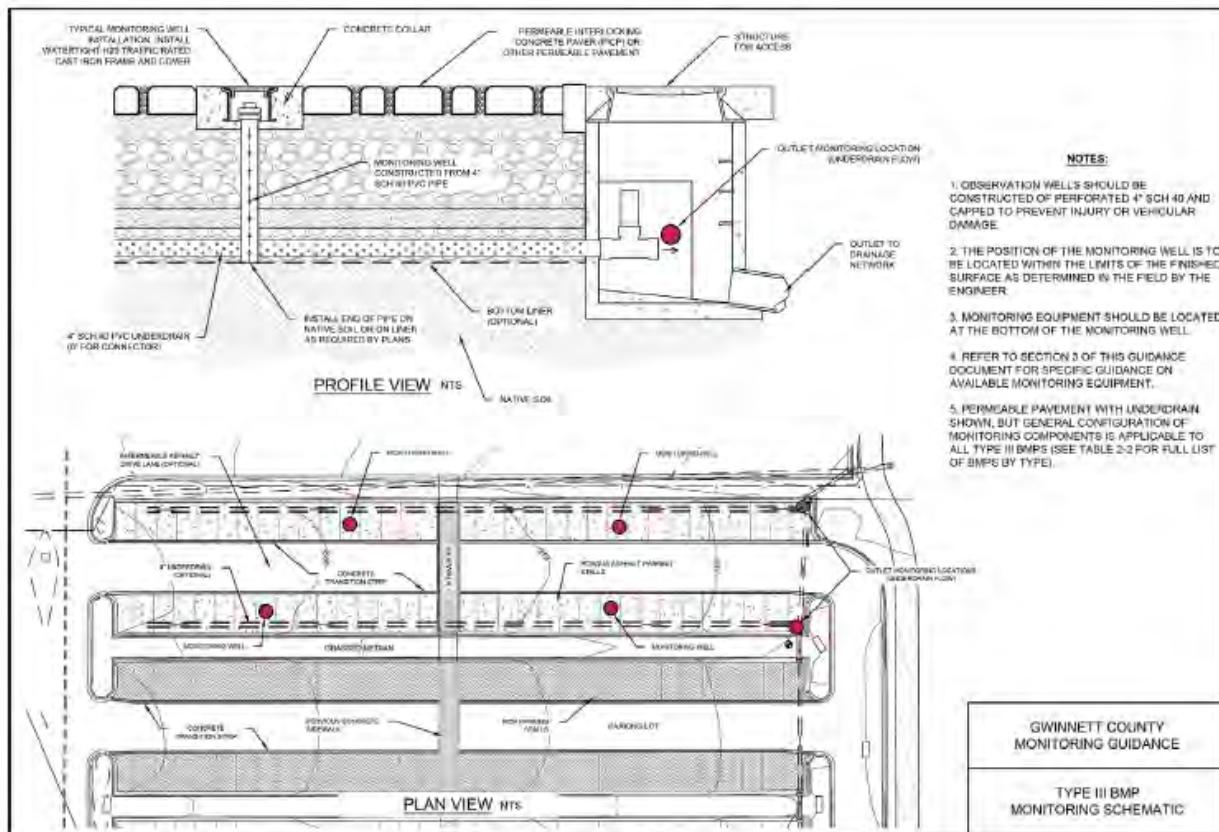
Example Schematic of a Permeable Pavement Site (Gwinnett County)
